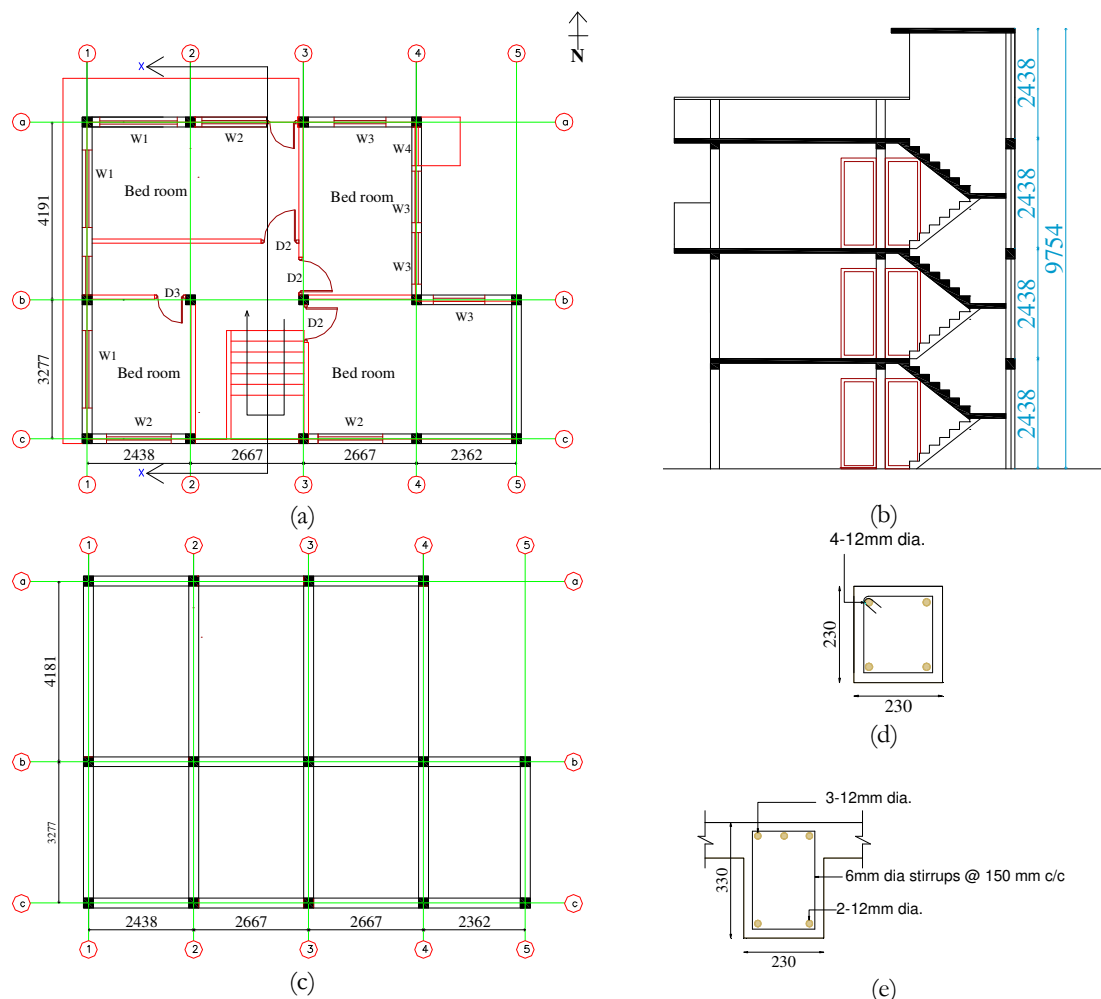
Geometrical details and section layout of the CCP1 building; (a) Typical floor plan, (b) Cross-section, (c) Typical beam and column layout, (d) Typical column section and (e) Typical beam section (all dimensions are in mm)
